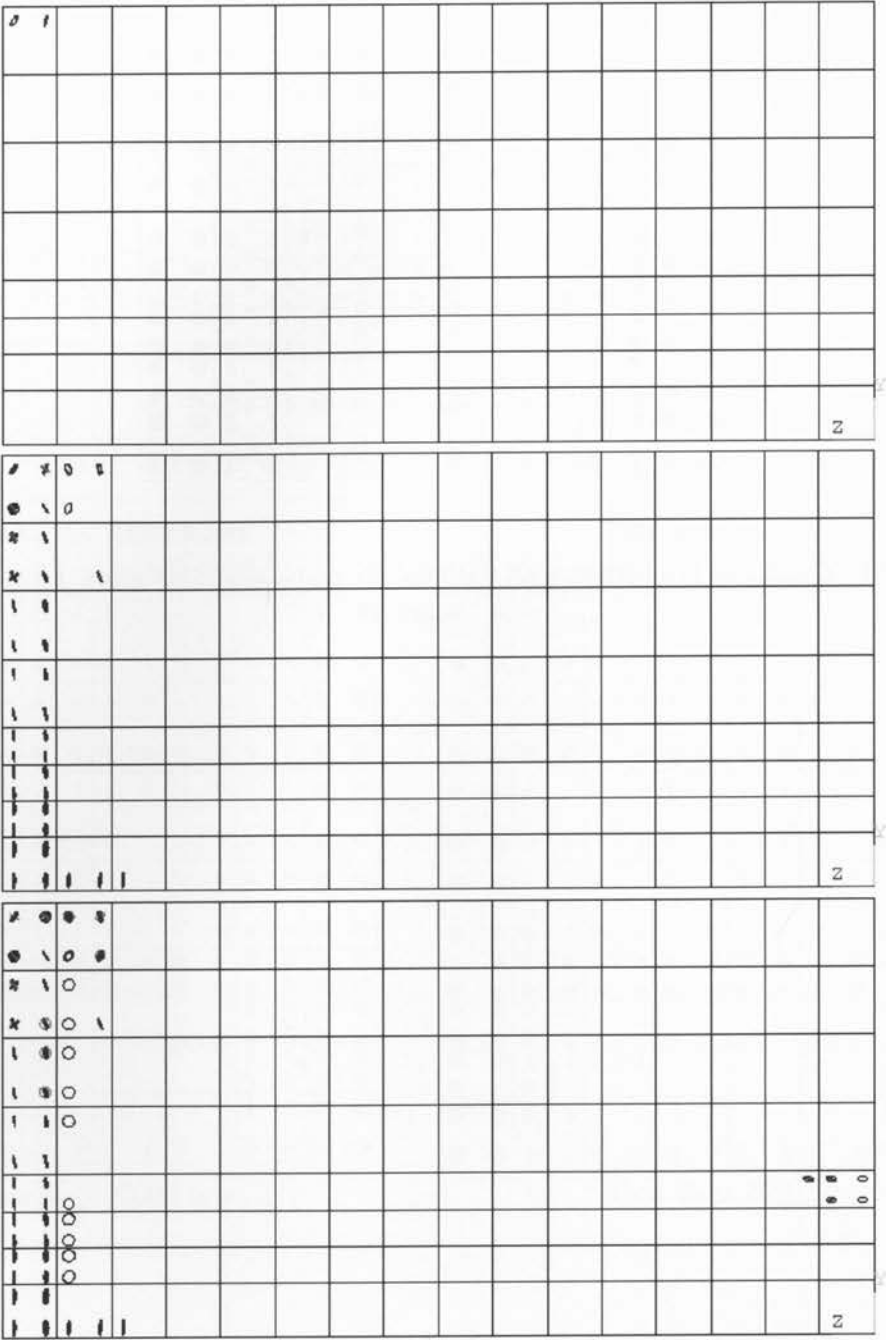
Crack patterns of 2 m barrier wall (fix – free) @ 10, 100 & 300 hours
